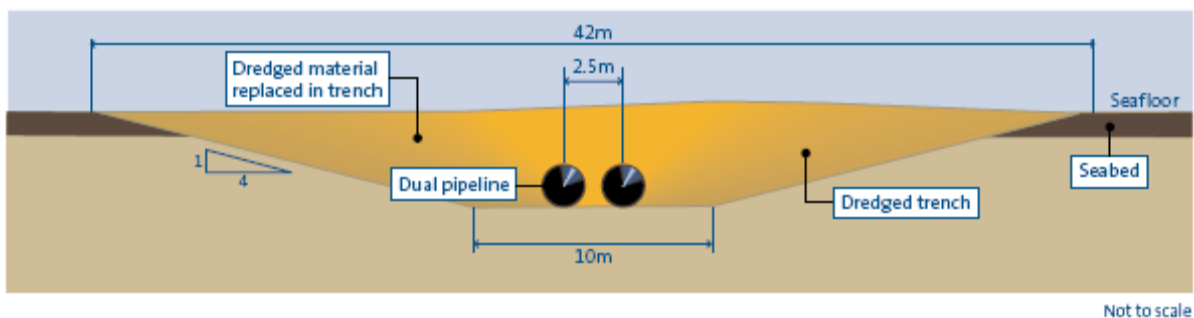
Indicative cross-section of trench in Botany Bay (outside of seagrasses)
